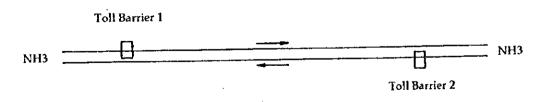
Toll Collection System proposed for Gwalior Bypass
